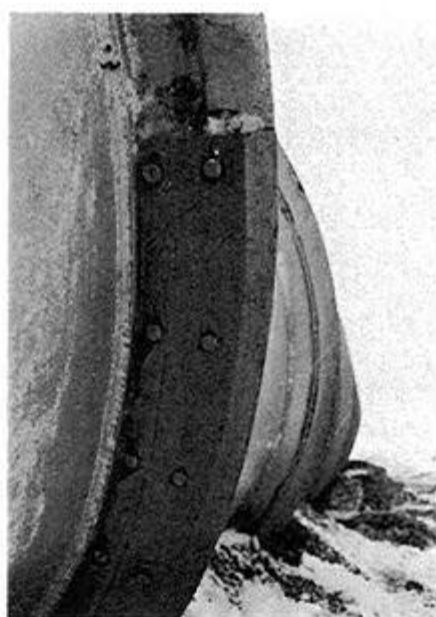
Steel Blade Bolted to Aluminum Alloy Foundation
